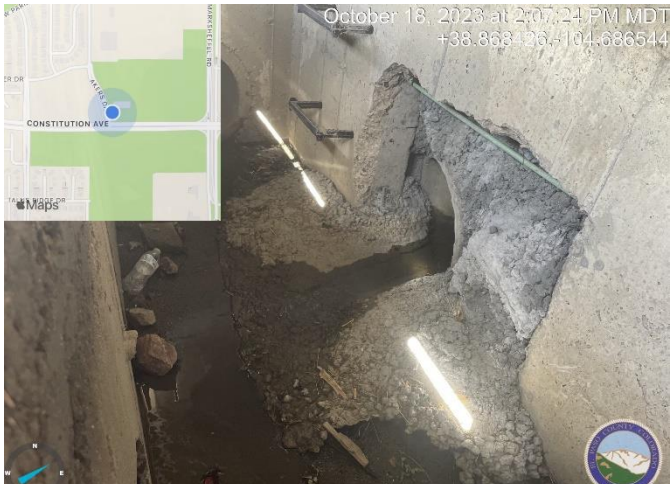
Finish grouting pipe collar to existing inlet on southwest corner of Akers Drive.
